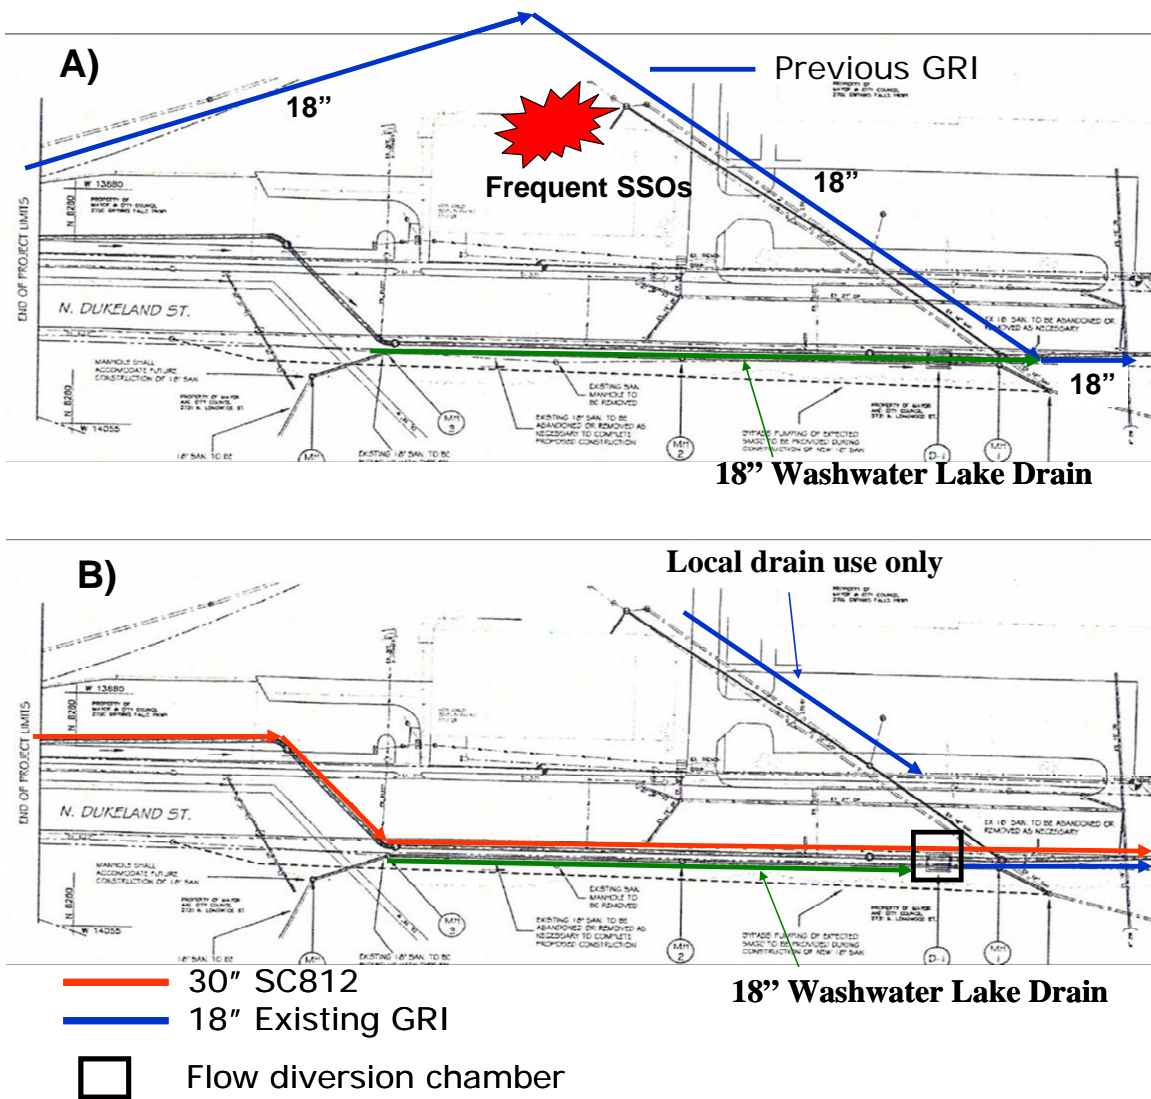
Sewer Network near Washwater Lake A) before and B) After SC812 was Installed
